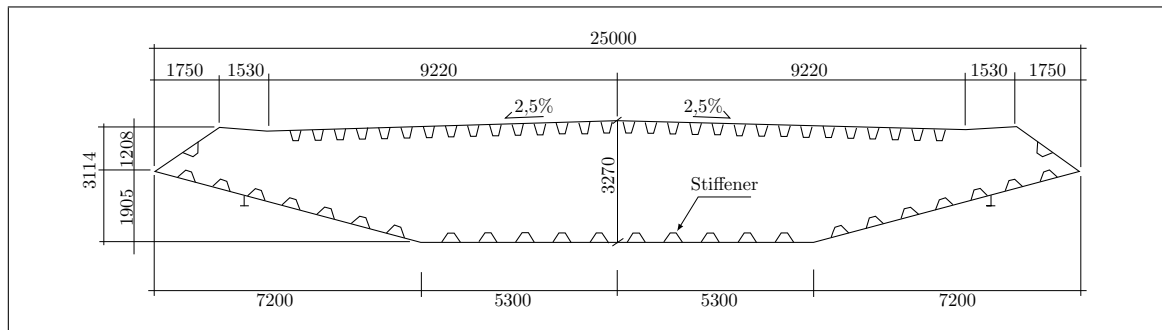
Cross section of steel box girder. All the dimensions are outer dimensions. Units in millimeters.
